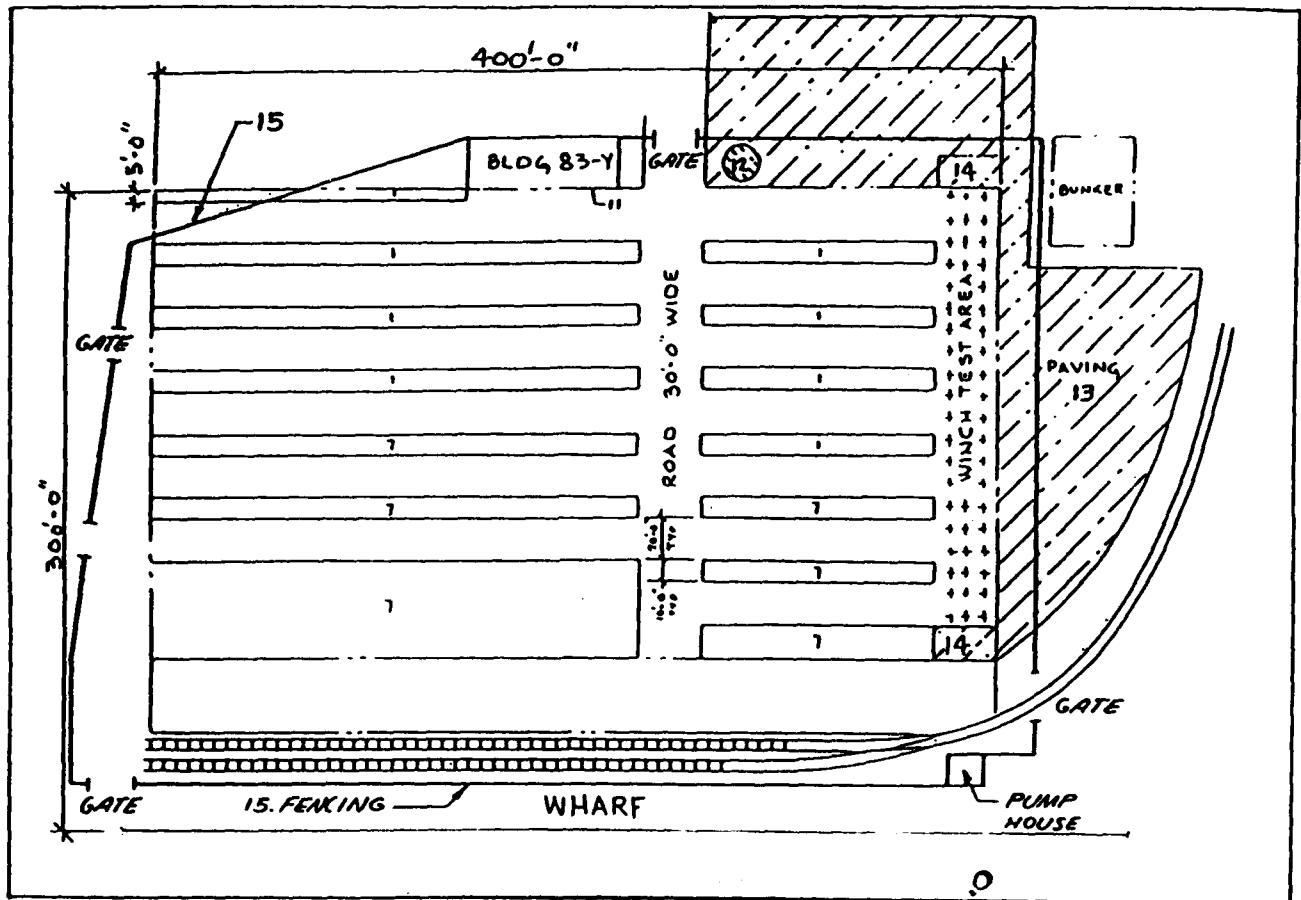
Proposed layout of the Hardstand showing re-arrangement of storage and addition of fresh water, security lighting, a winch test area and additional paving.
